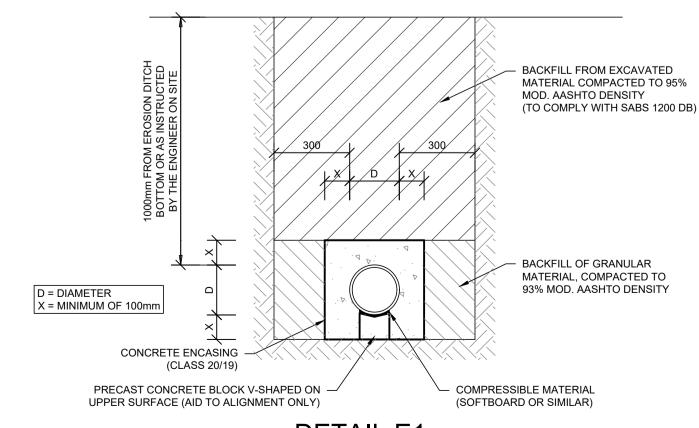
BEDDING FOR FLEXIBLE SEWER PIPES
